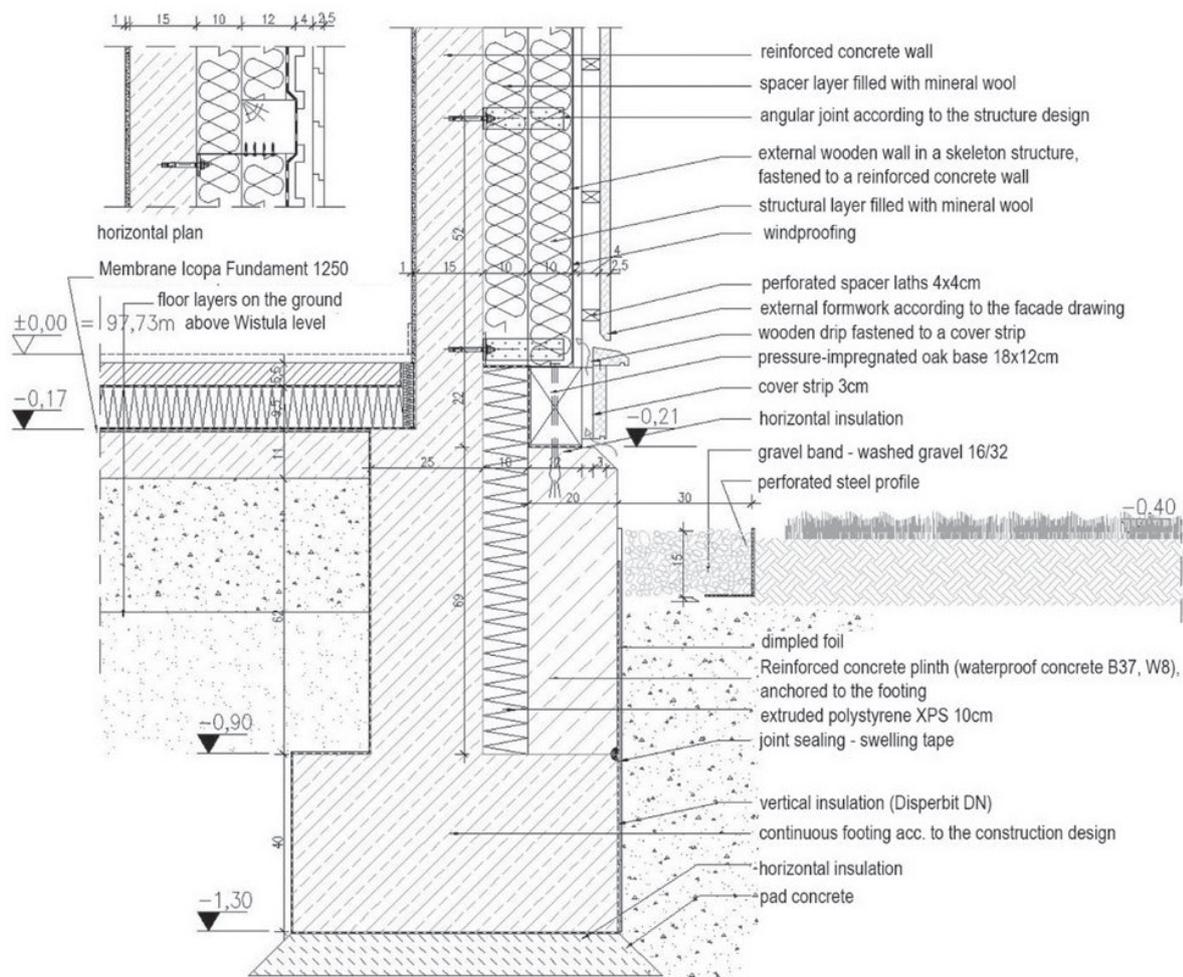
Cross-section through the footing and the outer wall of the modernized Abram Gurewicz Health Resort, consisting of a thin inner reinforced concrete partition and a self-supporting wooden outer structure with formwork mounted on it (source: archive of Grupa 5 Architekci)
